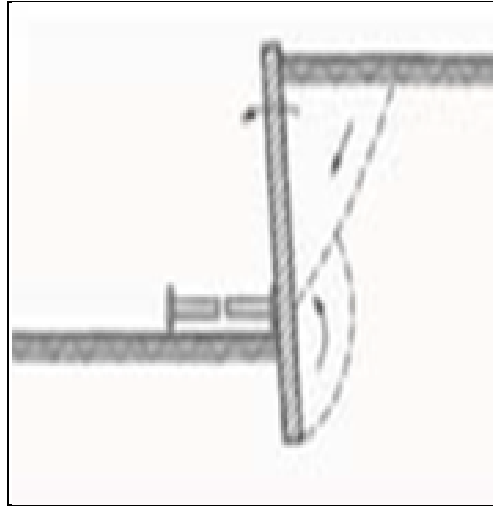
Failure of brace wall due to excessive loading [60, 61]
